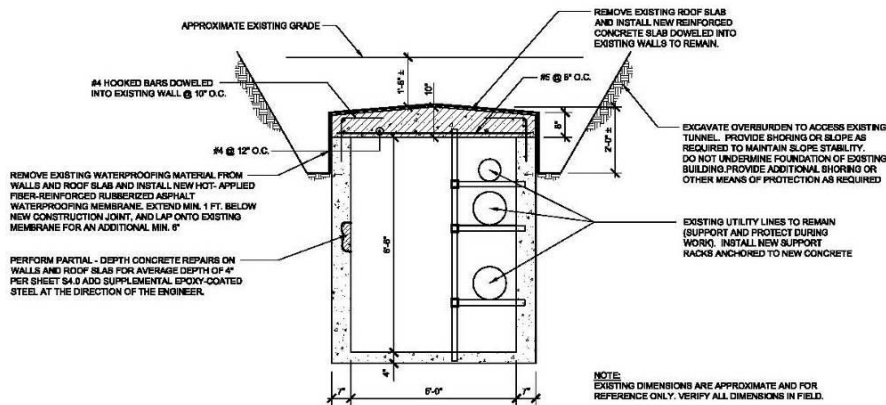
Repair Option 2, partial replacement and waterproofing of tunnel structure. Replacement of roof slab with full and partial depth concrete repairs on walls.
